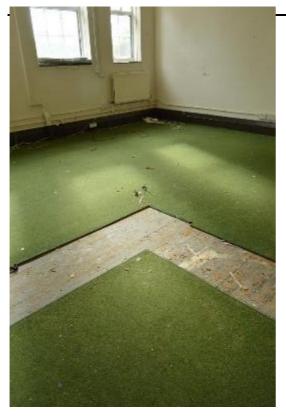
Building 9, original range, first floor, timber floorboards (371)
